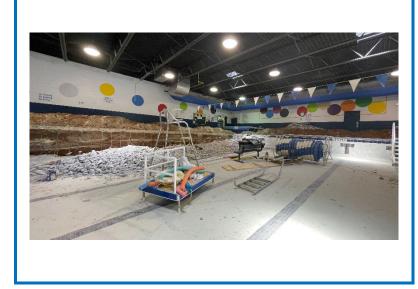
Excavated area W and North of Pool. View from SE 5/2023
